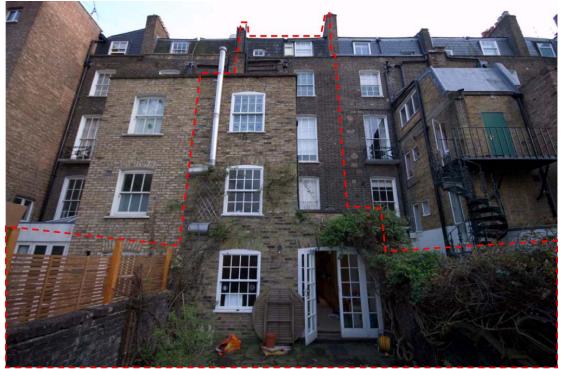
view of the rear façade of No.38 Gloucester Crescent
